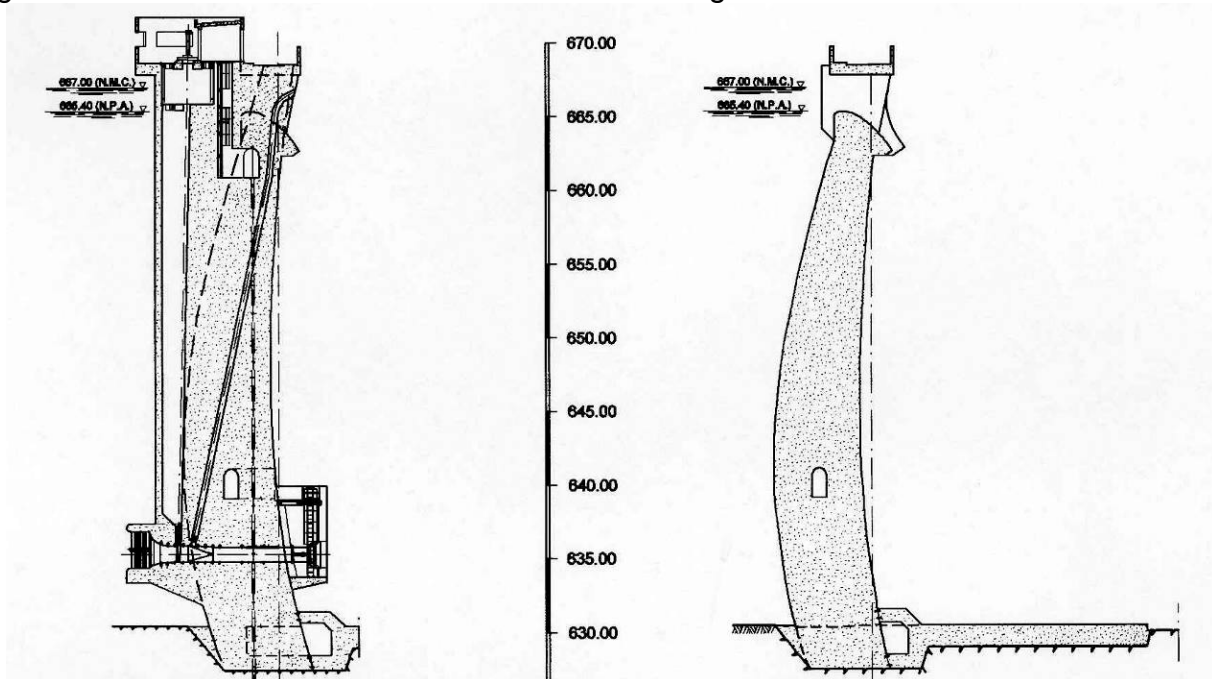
Cross sections: bottom outlet (left) and central cantilever (right)
